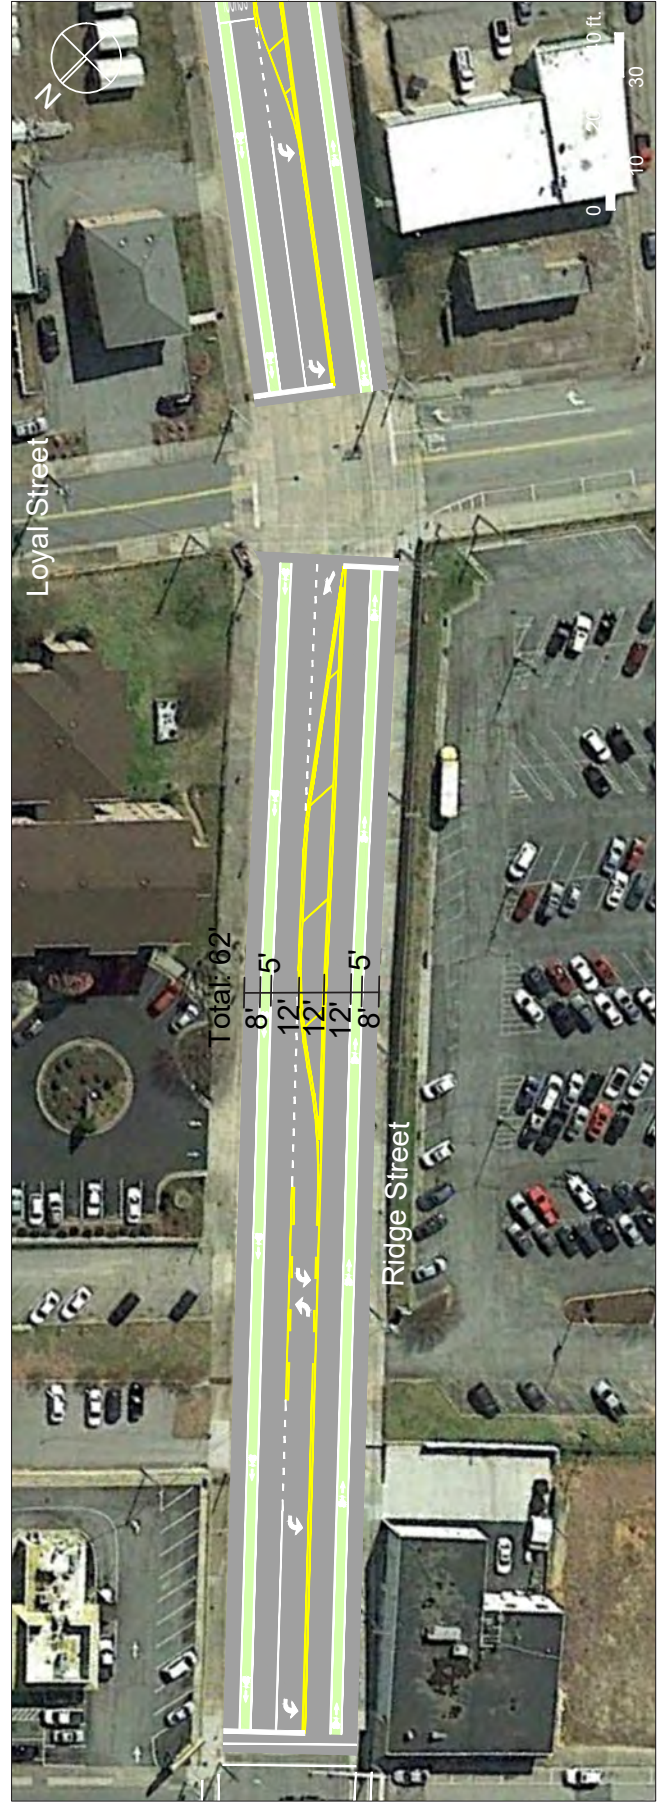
Ridge Street Road Diet Rendering (Page 2 of 4)
